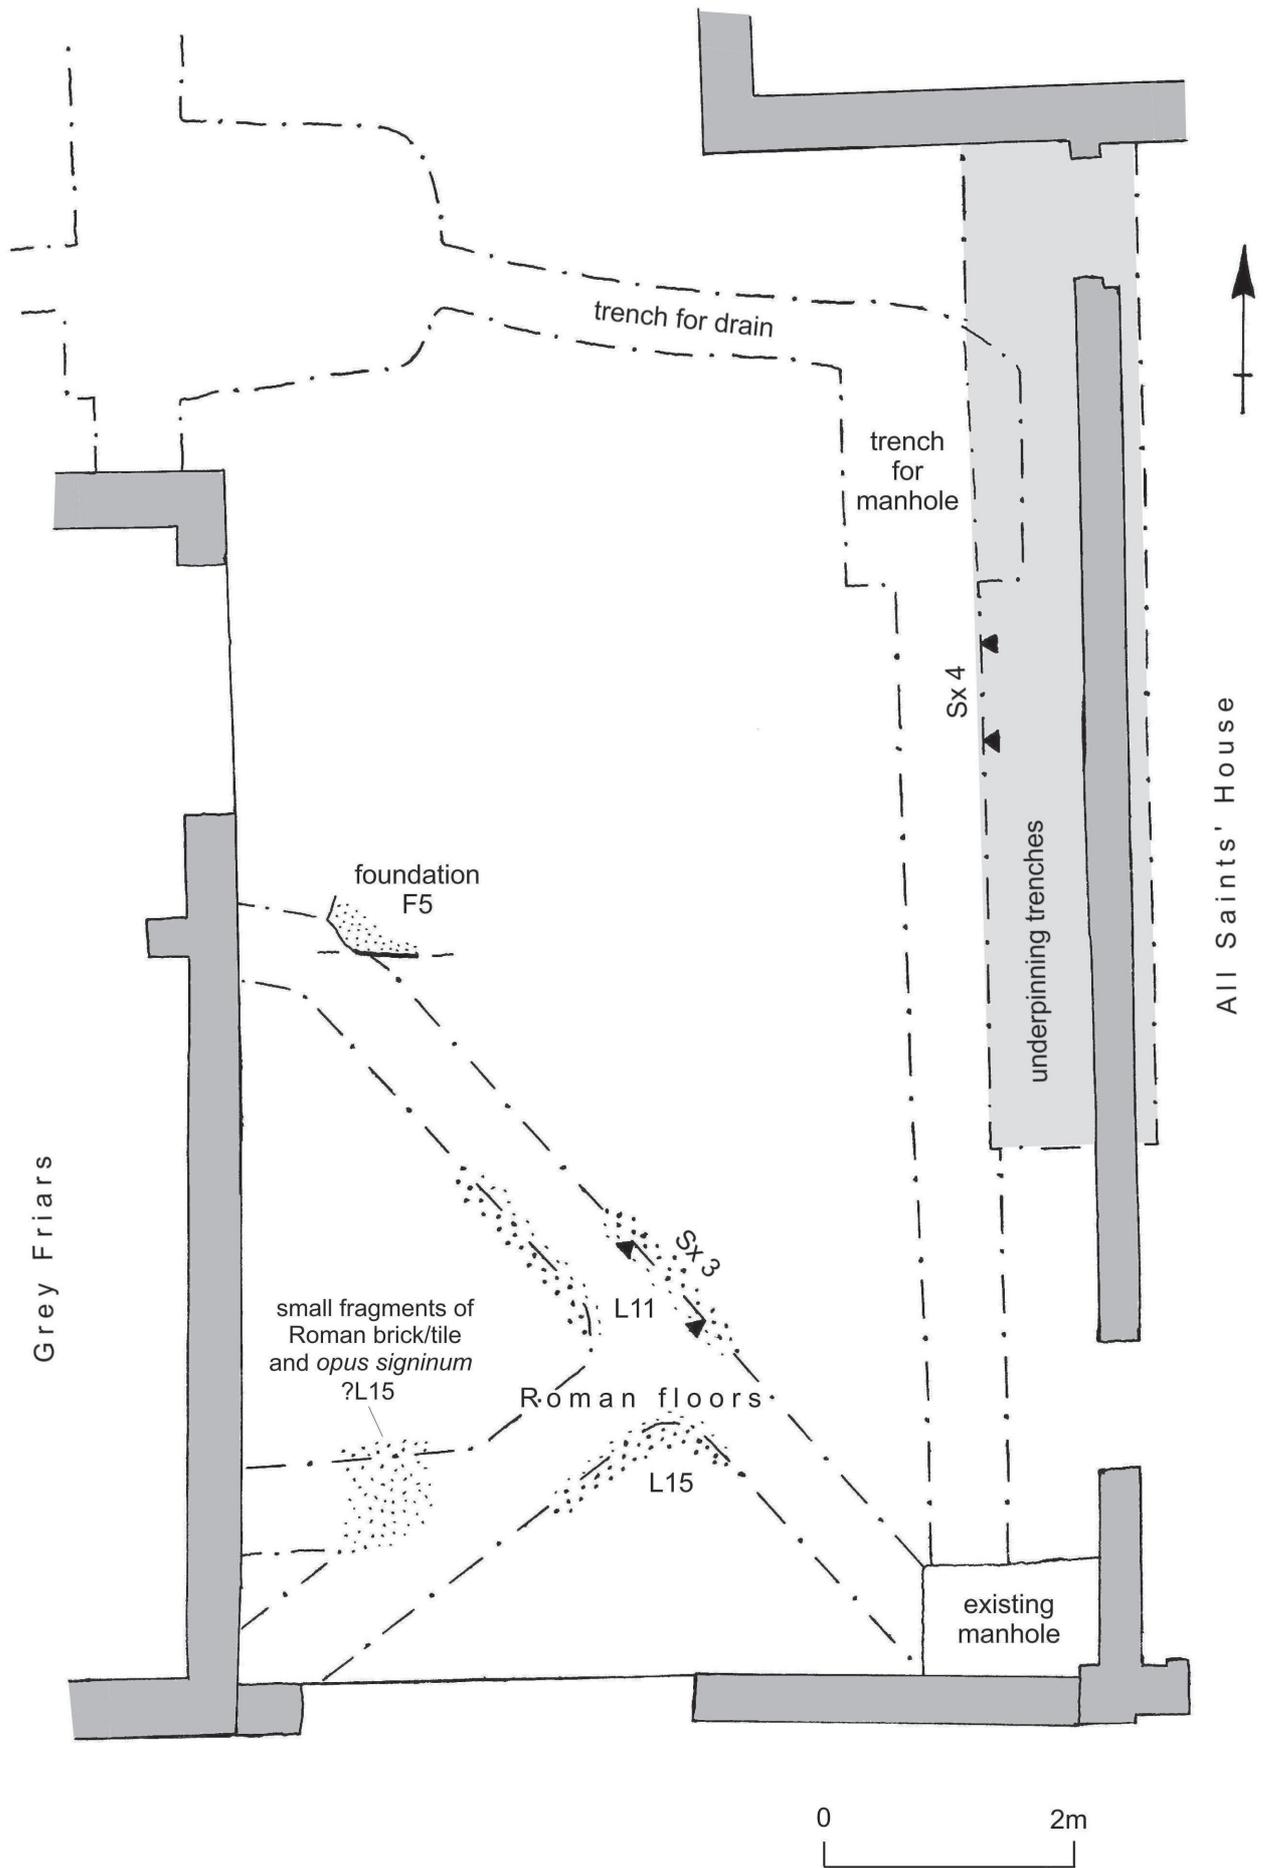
Plan of the entrance foyer area between Grey Friars and All Saints' House.
